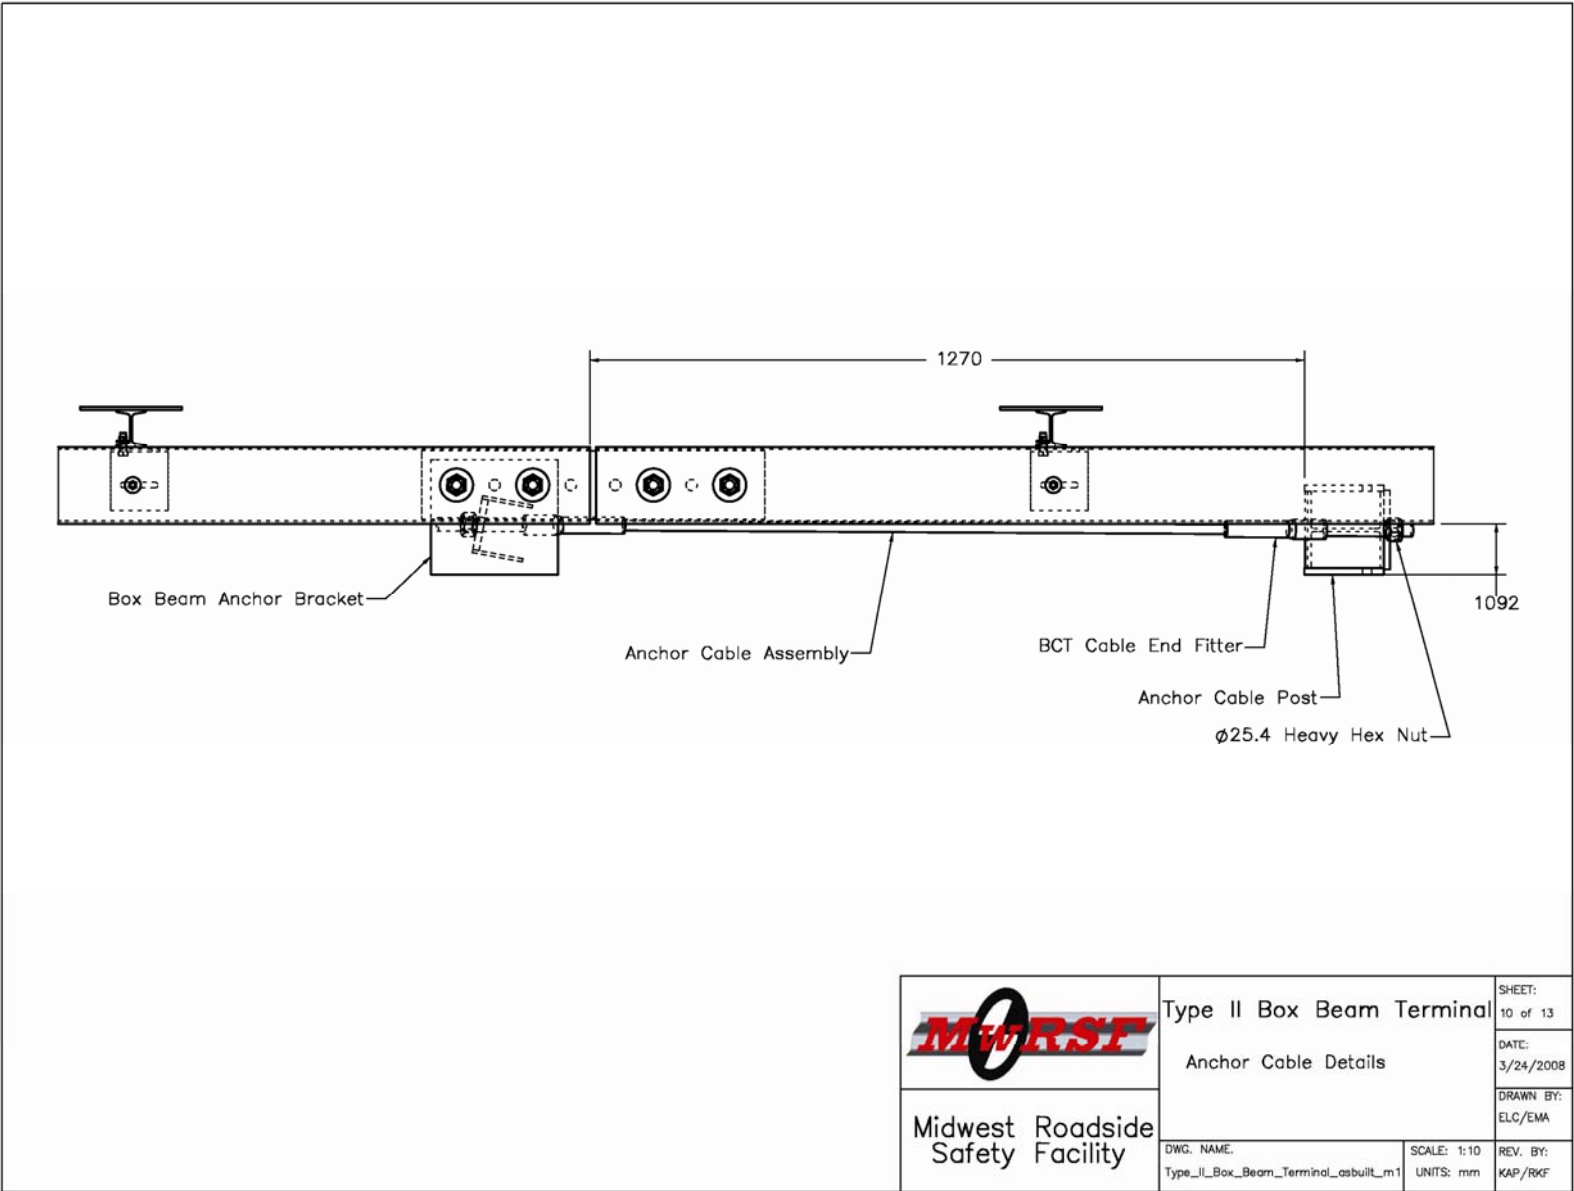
Type II Box Beam System Details, Test No. NYBBT-1
